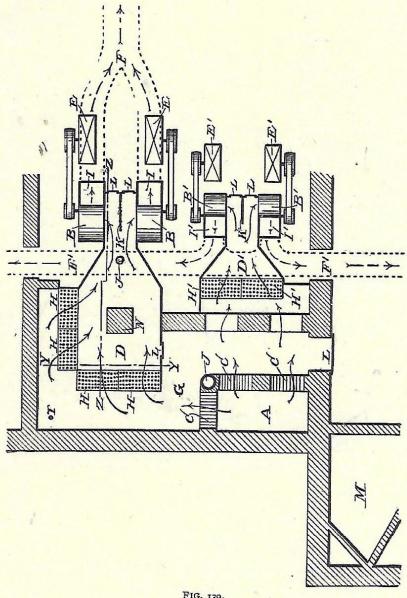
shows the heating, cooling and blowing plant. A is the fresh-air shaft from the roof, 6x12 feet, supplying the distributing
